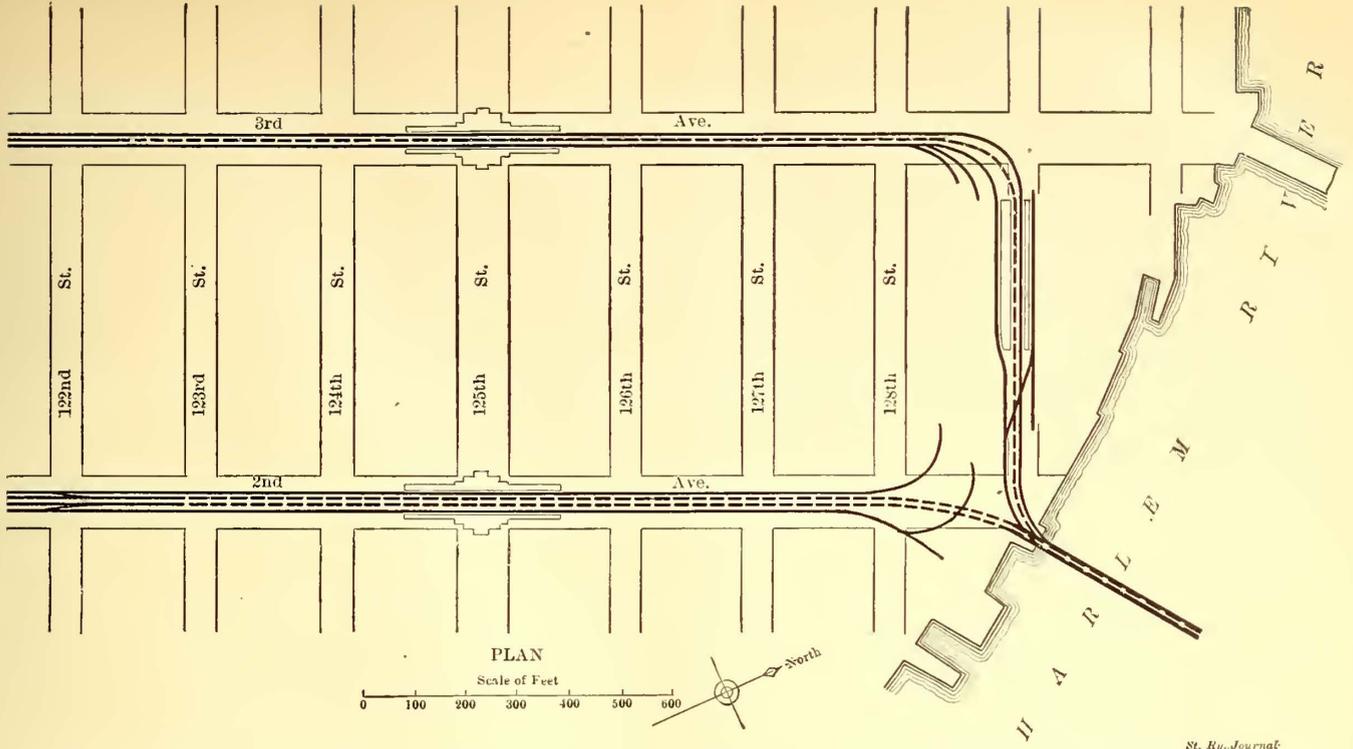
PROPOSED LAYOUT OF SECOND AND THIRD AVENUE ELEVATED TRACKS APPROACHING THE HARLEM RIVER
